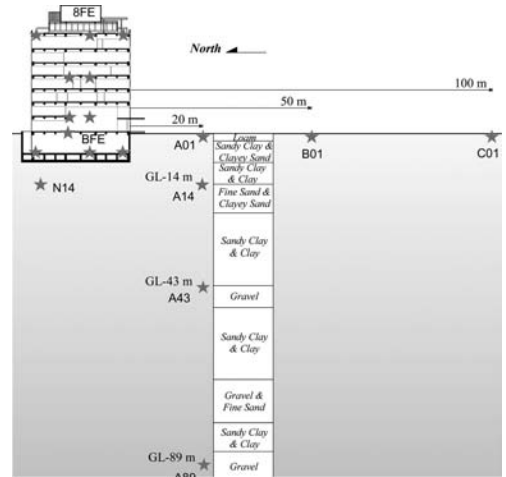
Layout of the seismic observation system in BRI annex building and in surrounding soil.
